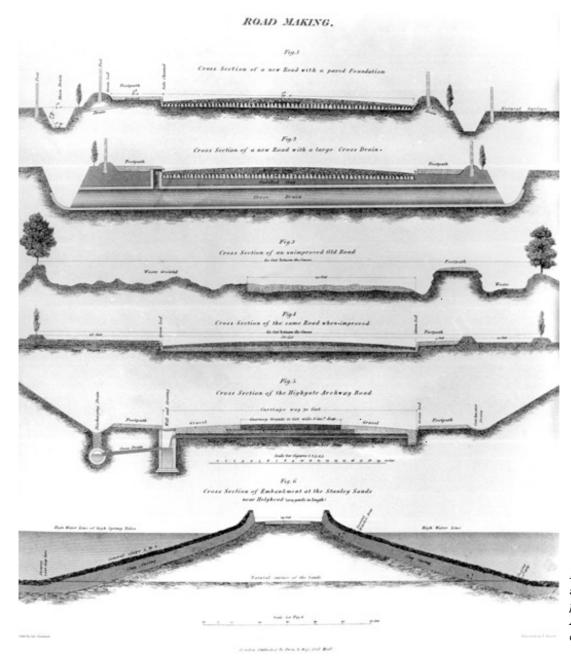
Cross section of plans from Telford's Atlas, showing the camber required
